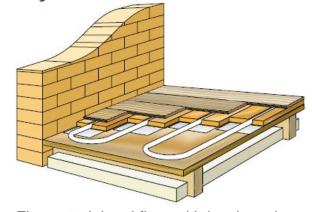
Joisted floor with hardwood or laminate floor coverings [11]
